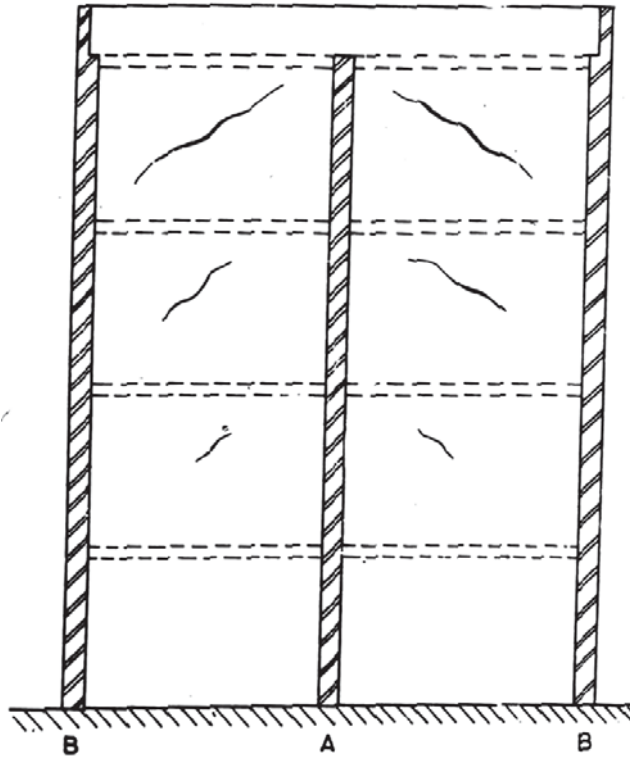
Diagonal Cracks in Cross Walls of Multi-Storied Load Bearing Structures (Ref : SP25 (S&T) 1984)
